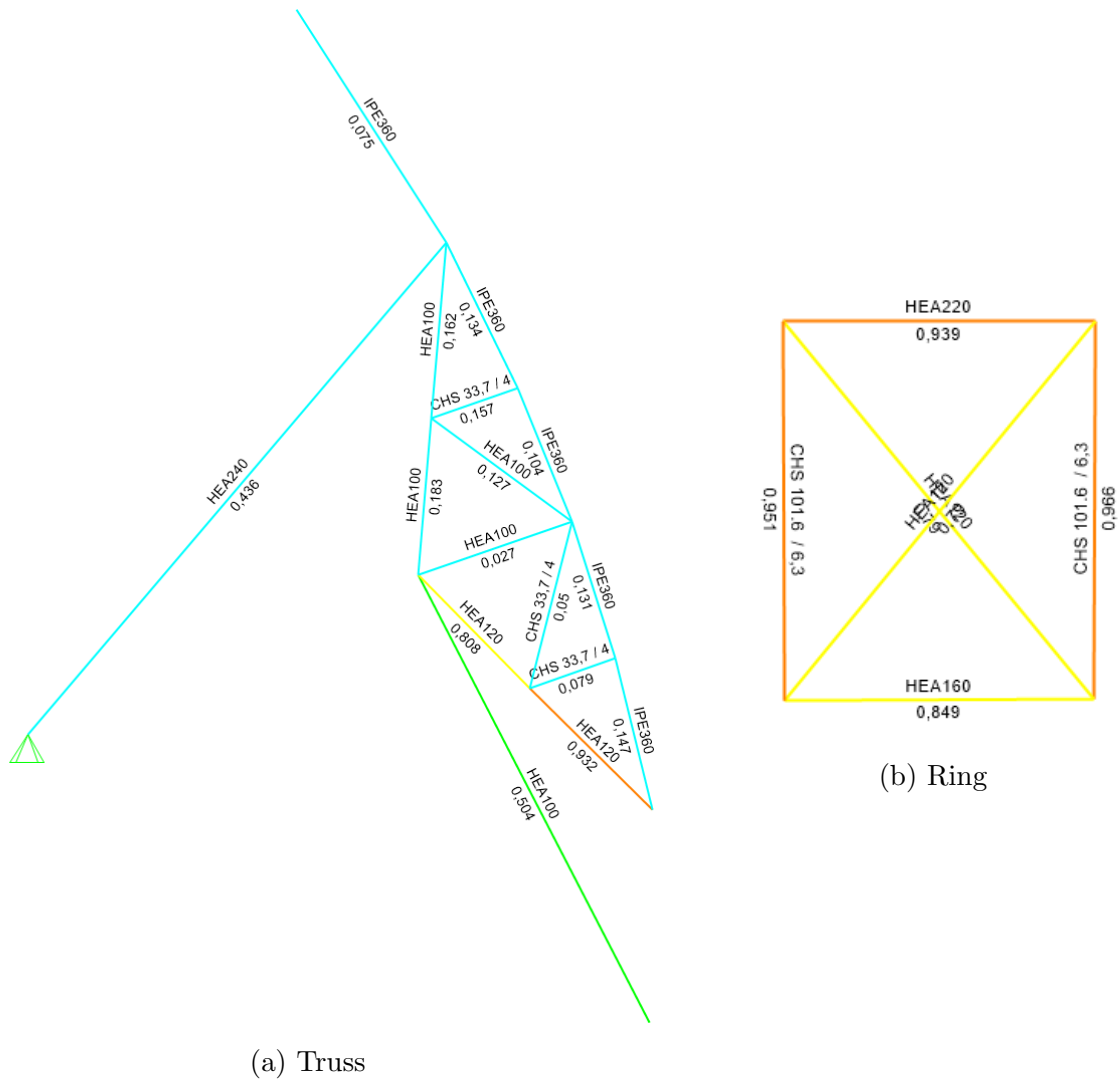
SAP2000 steel design / check for structure, lifting structure, new members (all pass)
